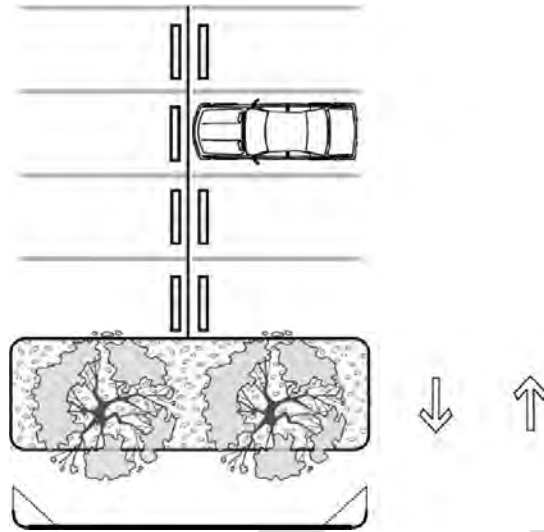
V: EXAMPLE OF TANDEM PARKING, STRUCTURED PARKING AND/OR SURFACE LOT PARKING SCENARIO
